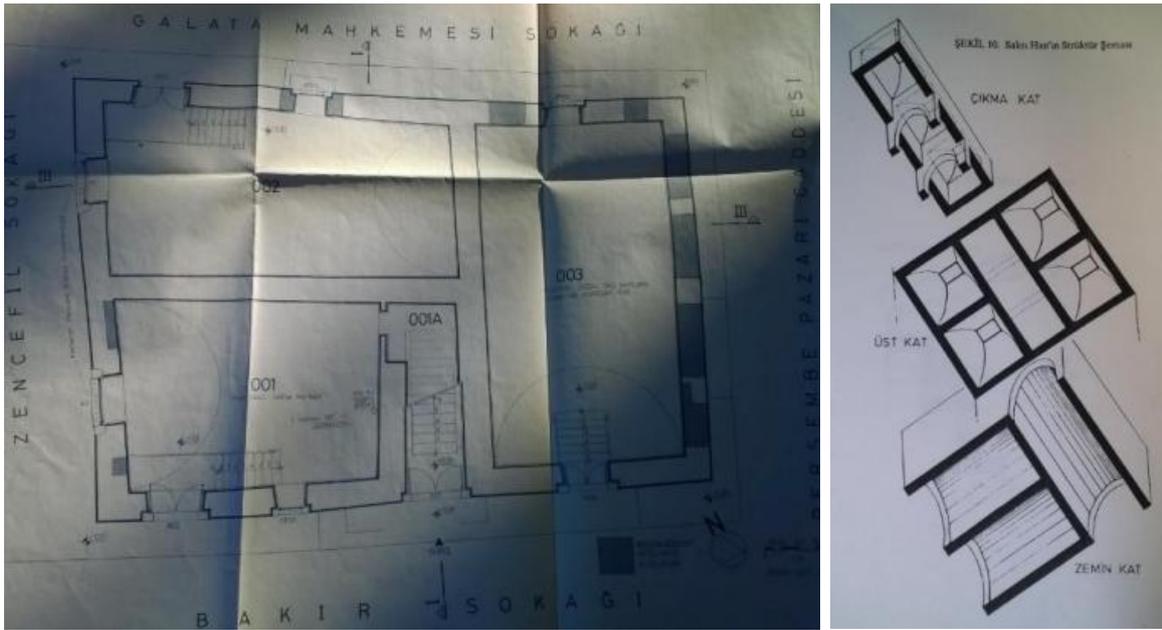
Ground floor plan and the spatial arrangement of Saksı Han (Alioğlu, 1992)
